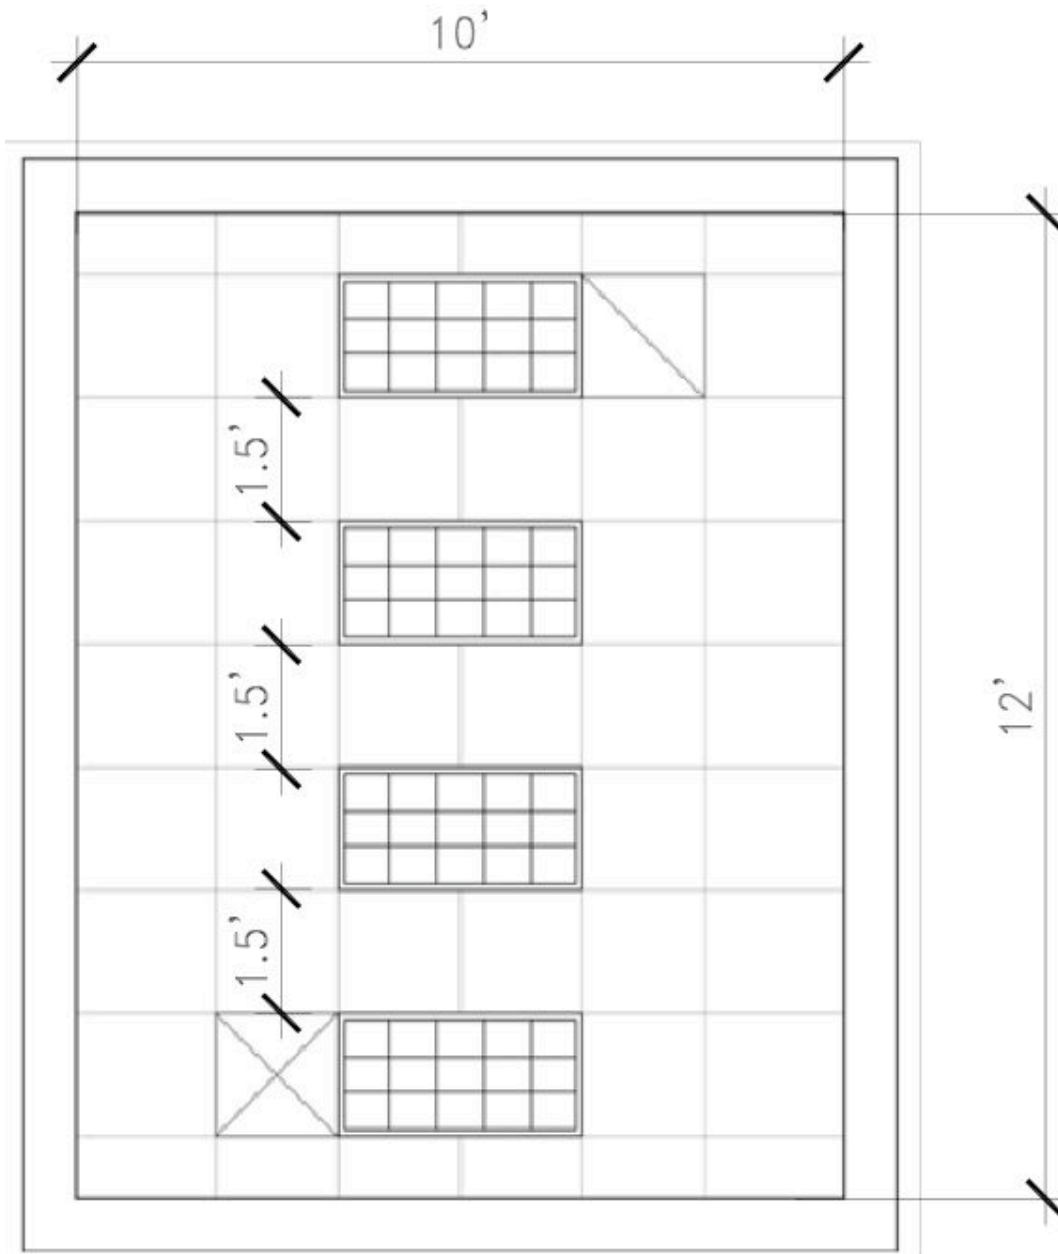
Proposed reflected ceiling plan of the test office with iBright LED lamps
